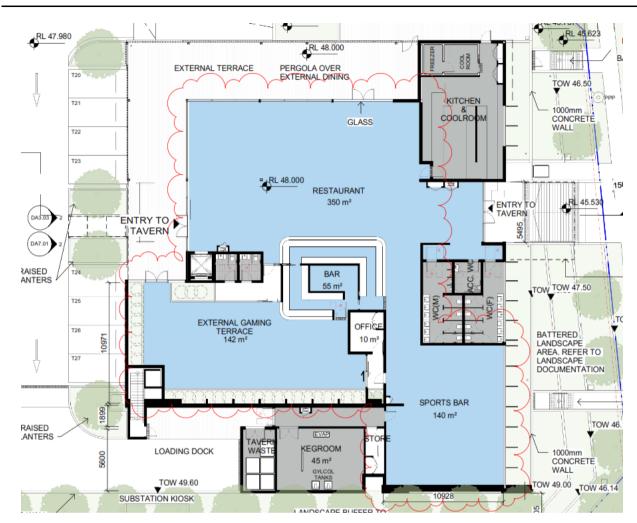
Proposed Modified Tavern Floor Plan-DA-698/2019/A
